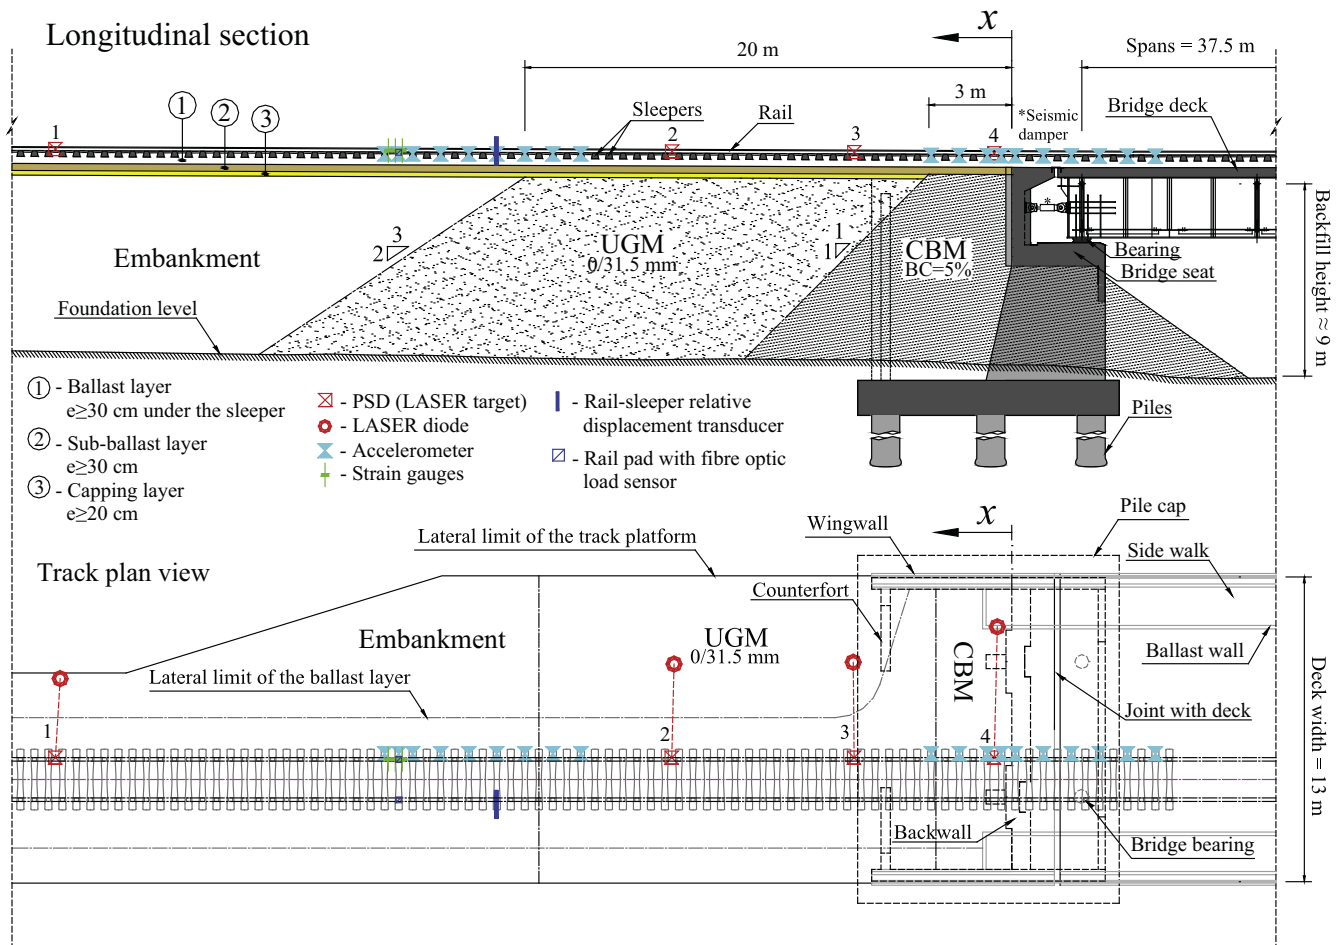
Schematic longitudinal profile and plan view of the transition zone.
